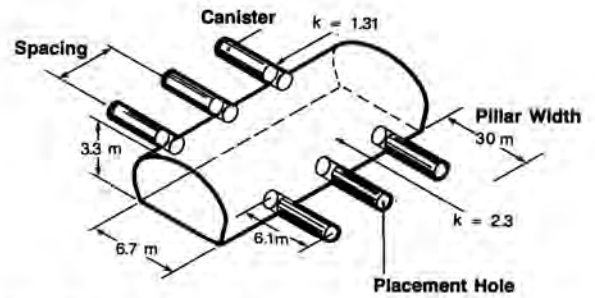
Alternative 3: Horizontal Short-hole Waste Emplacement Configuration.
